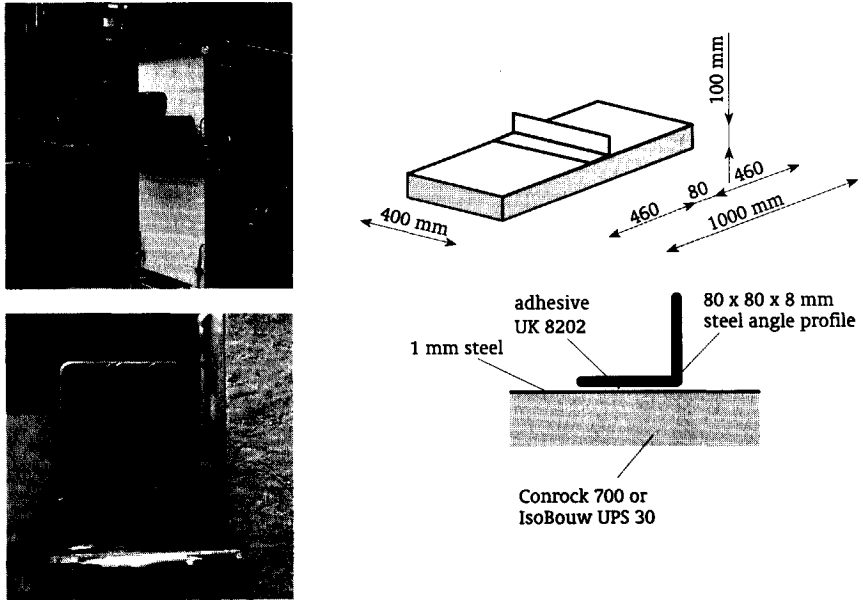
Tests on sandwich panel with an adhesively bonded plate
